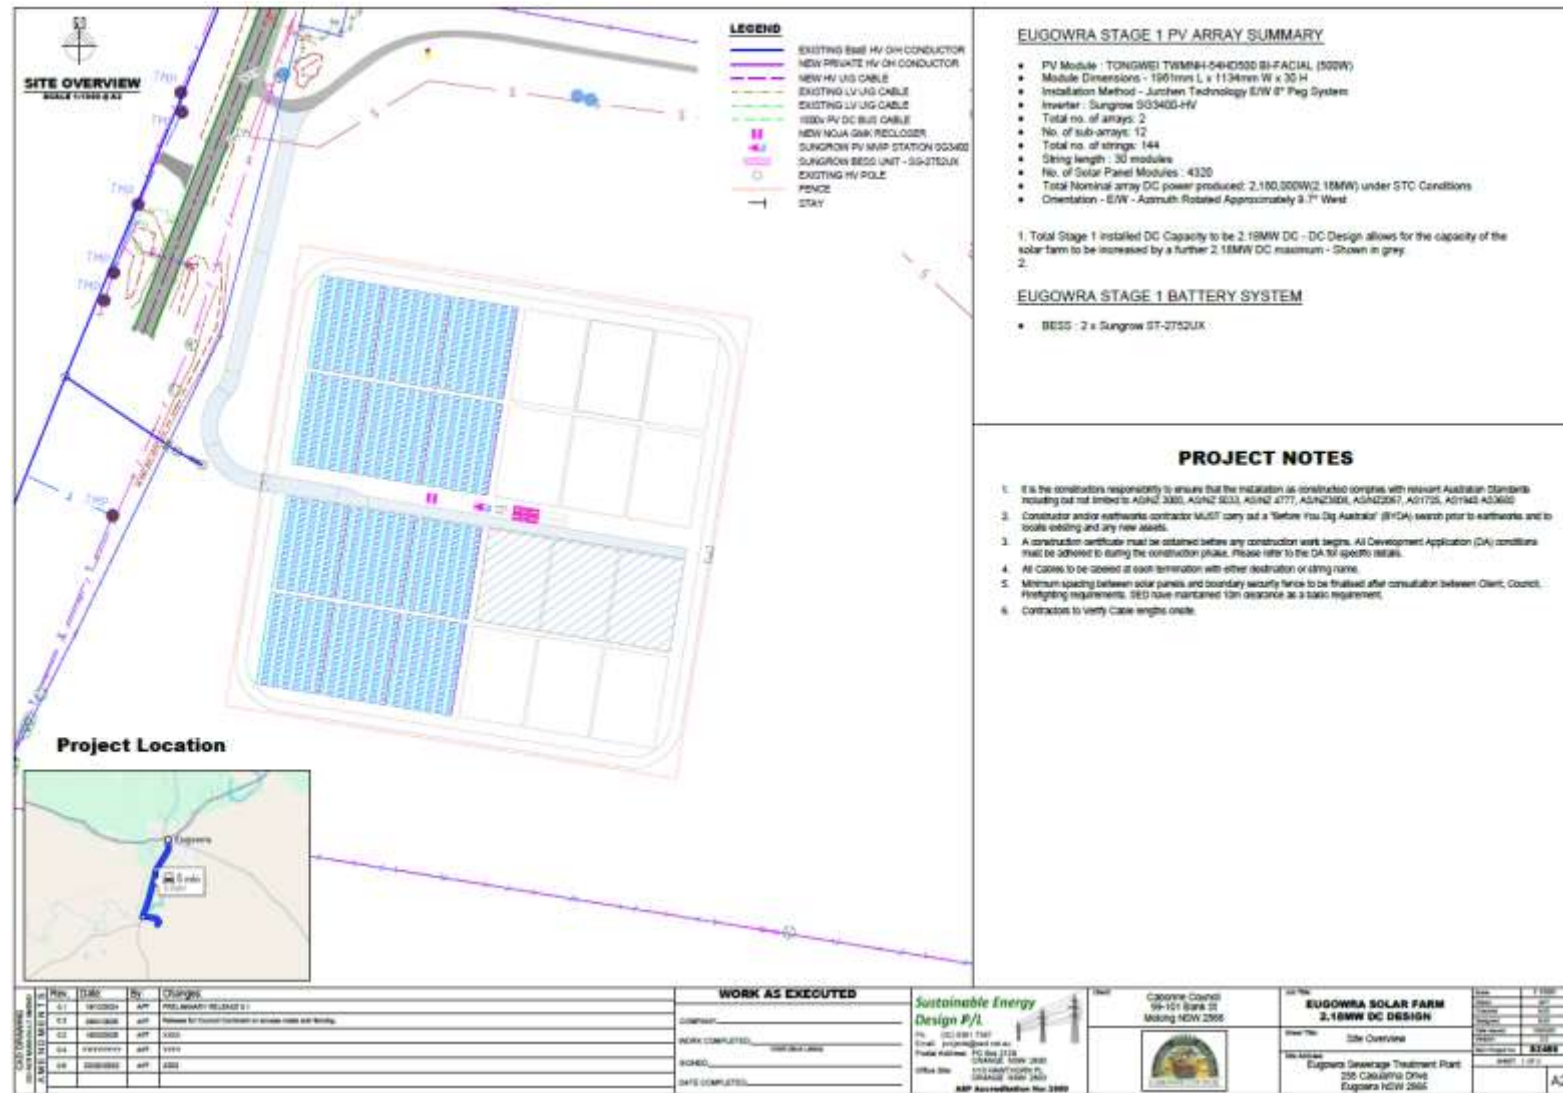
2025 Proposed Layout of Eugowra Solar Farm.
